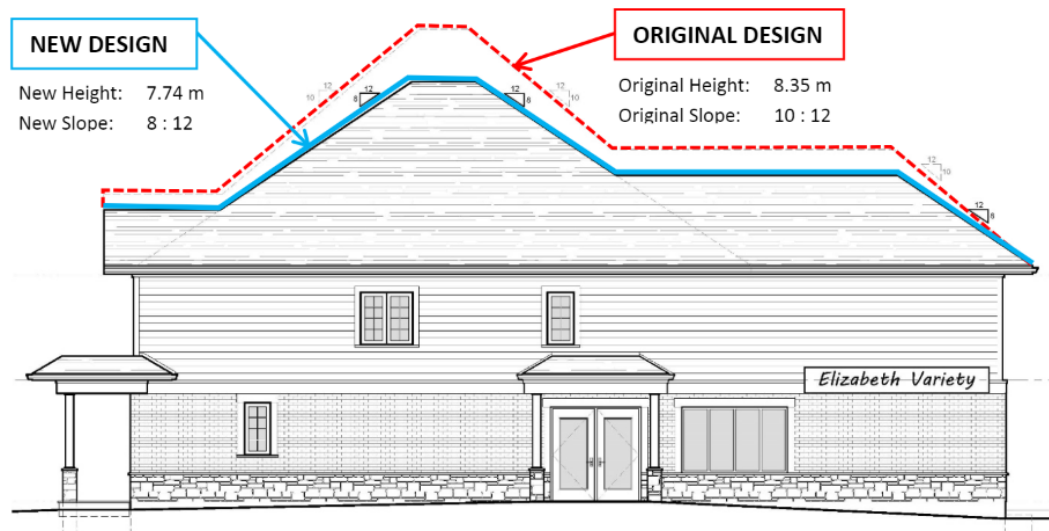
Elizabeth Street Elevation Comparison of Original and Revised Building
